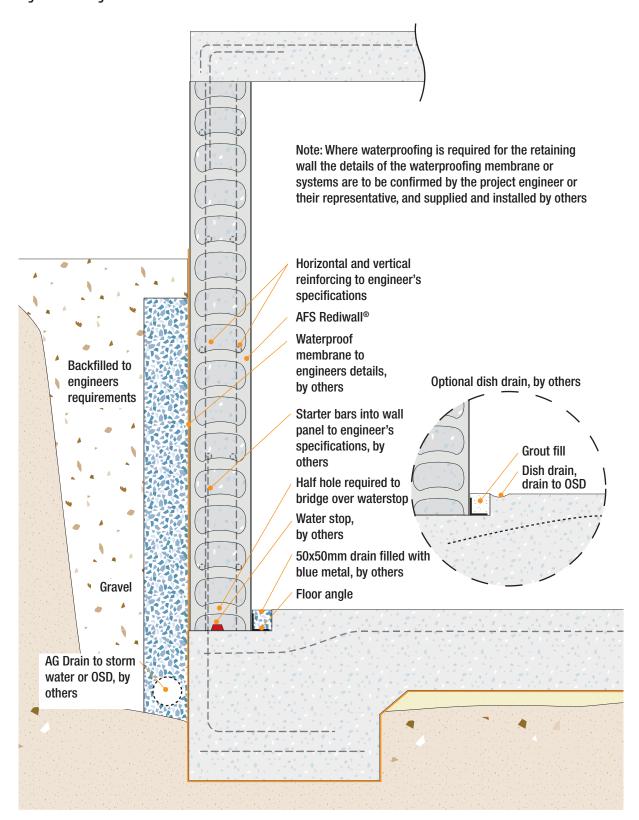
Cantilevered Retaining Wall (maximum height 3400mm)
